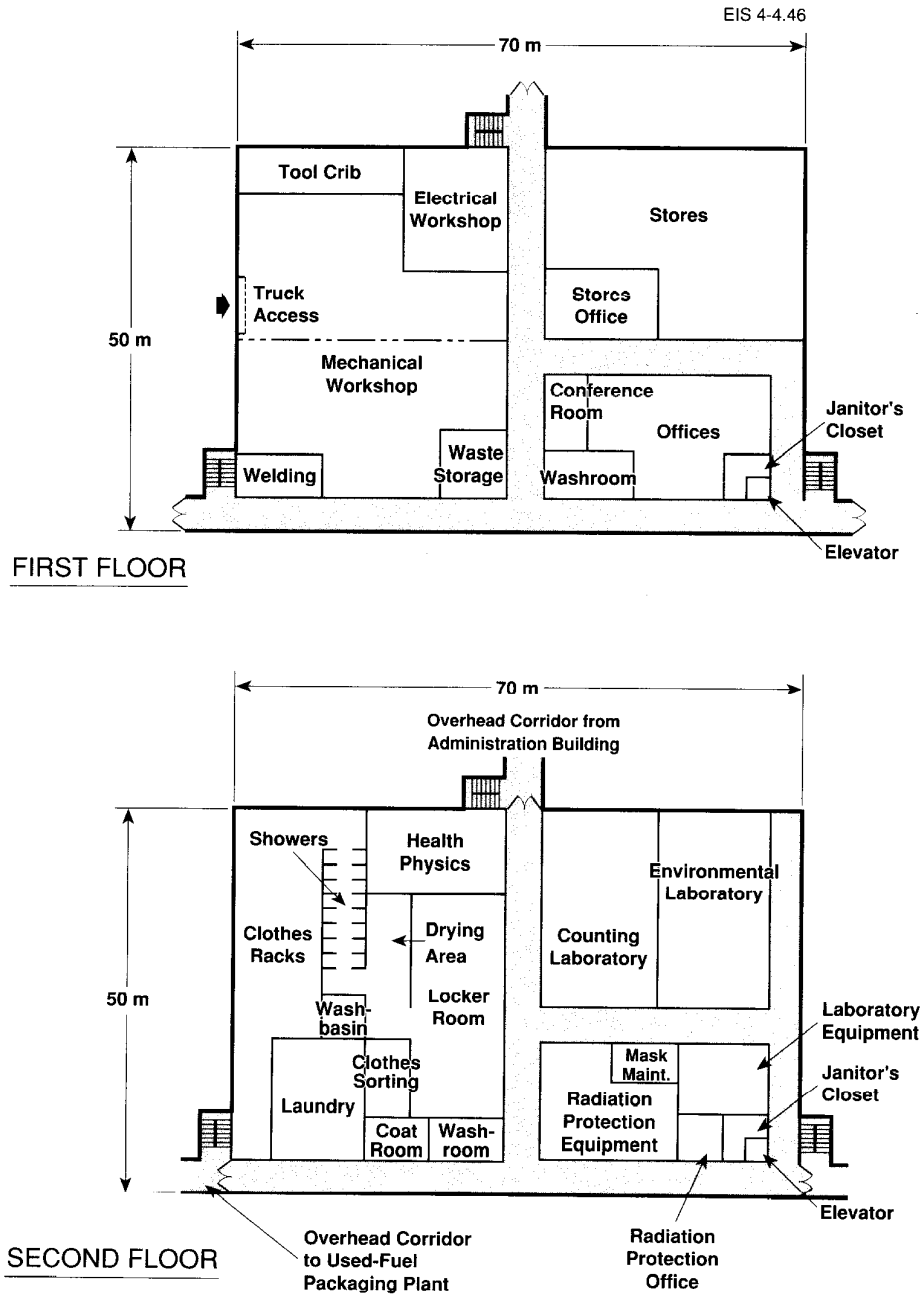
Auxiliary Building Floor Plans (after AECL CANDU et al. 1992)
